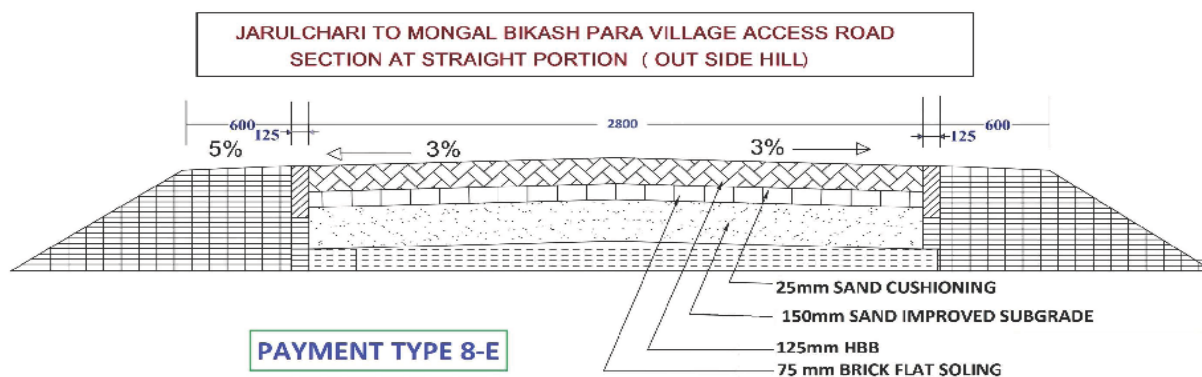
Example cross-section drawing of HBB road design (width 3.05m)
